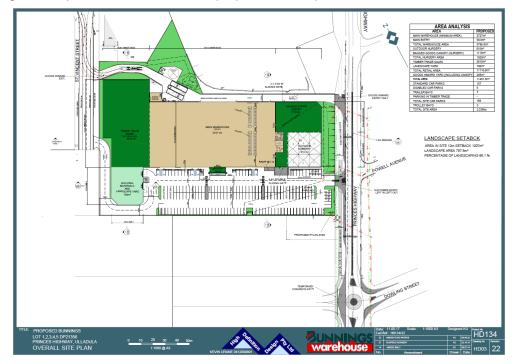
Overall site plan showing staged access direct from Princes Highway with provision of roundabout, median and entry/exits to Highway and St Vincent Street.
